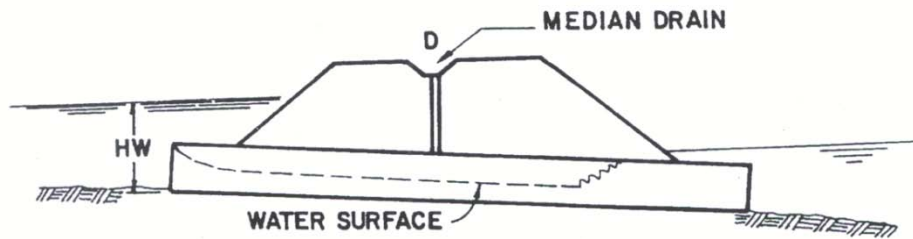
B: Outlet Submerged, Inlet Unsubmerged¹
